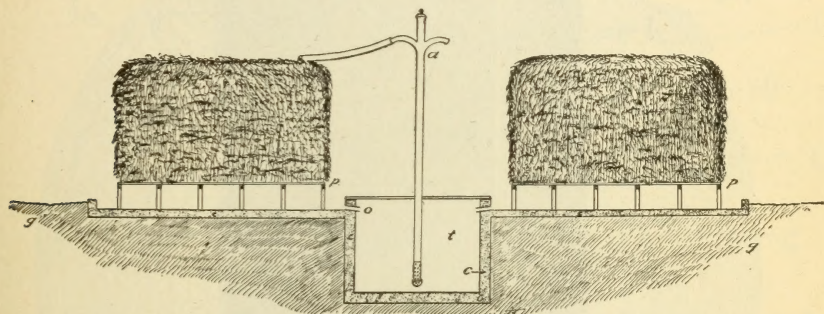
Imaginary cross section of an arrangement suggested for trapping maggots, for use where manure production is large: *a*, Pump; *c*, concrete floor and walls of cistern; *o*, outlet pipes leading from floor of maggot trap to cistern; *p*, platform maggot trap; *t*, cistern for liquid manure; *g*, ground level. (Hutchison.)
